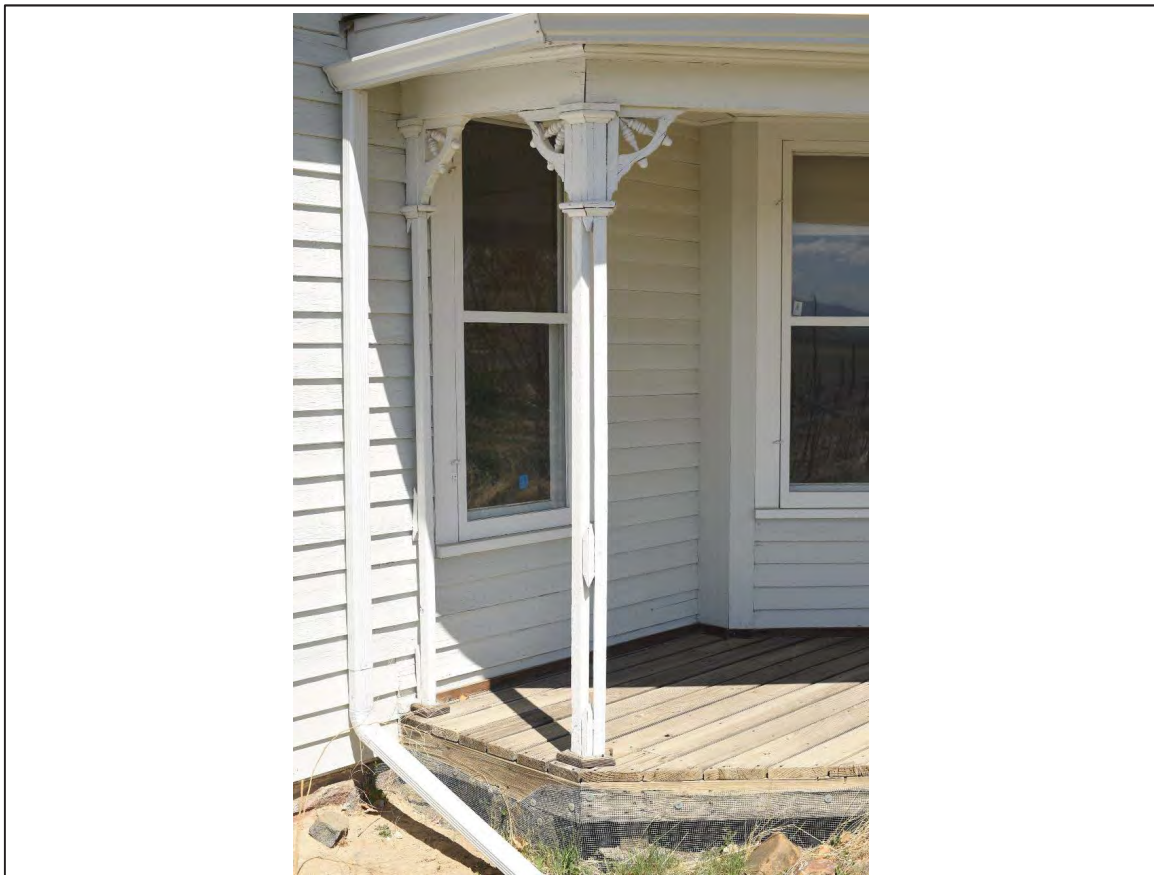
Overview of typical capital columns and spindles supporting roof over house's open porch.
